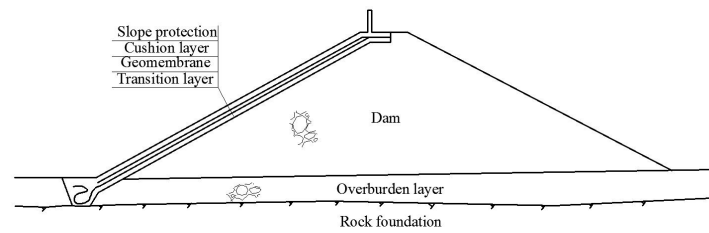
A typical sandy-gravel dam with geomembrane barrier on dam surface
